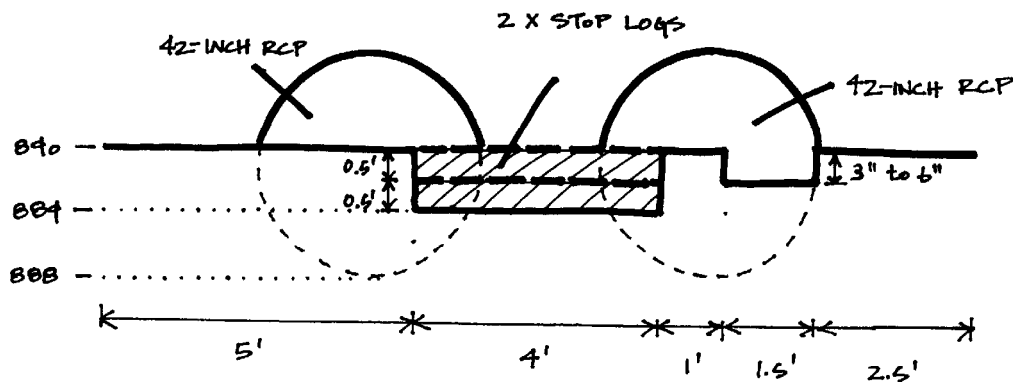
Cross Section of Proposed Long Lake Outlet Configuration at 72nd Street
